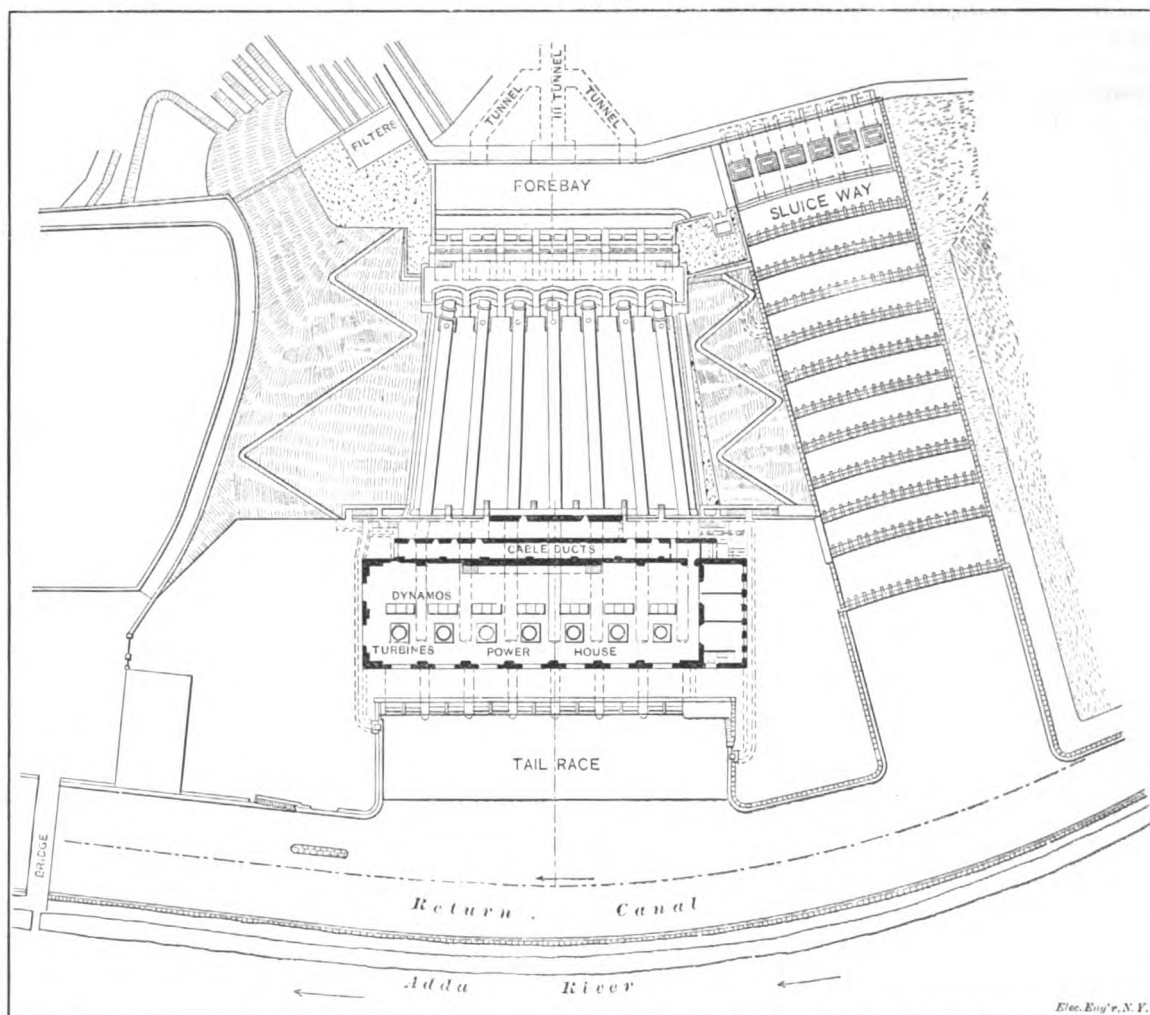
PLAN OF POWER HOUSE AND HYDRAULIC WORK, PADERNO POWER TRANSMISSION, ITALY.
